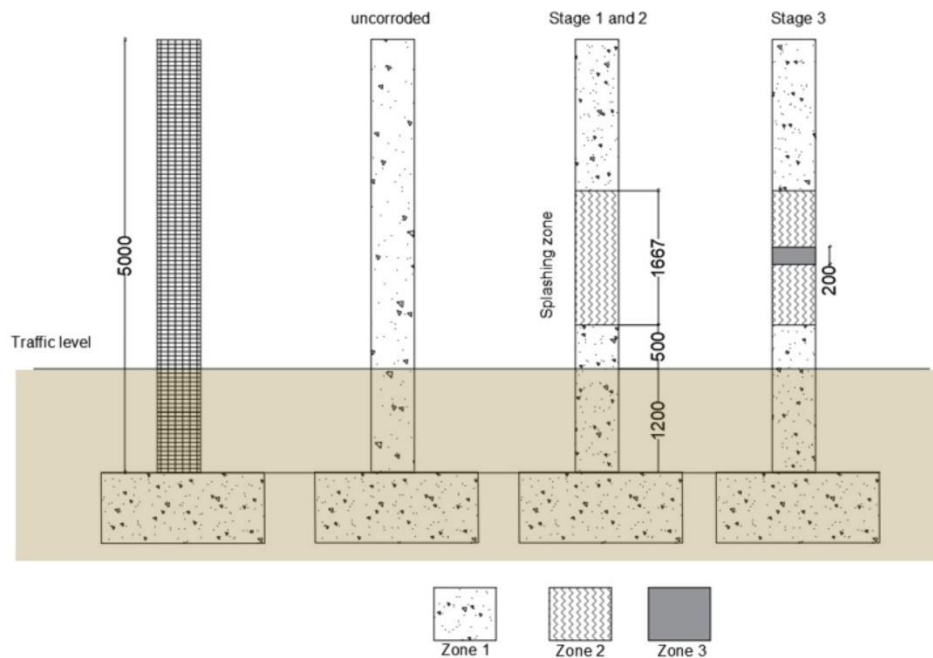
Configuration of designed RC pier at each damage state (all the dimensions are in mm)
